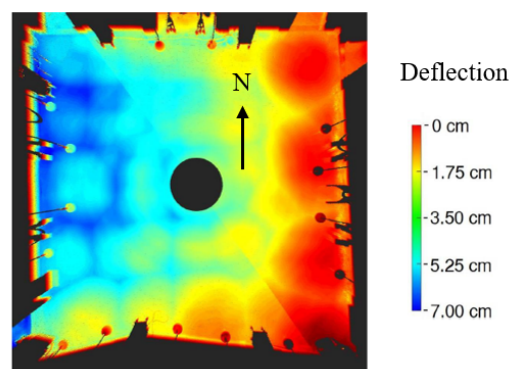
Settlement of the floor in the Room of the Elements; the west wall was analyzed in this work due to cracking.
